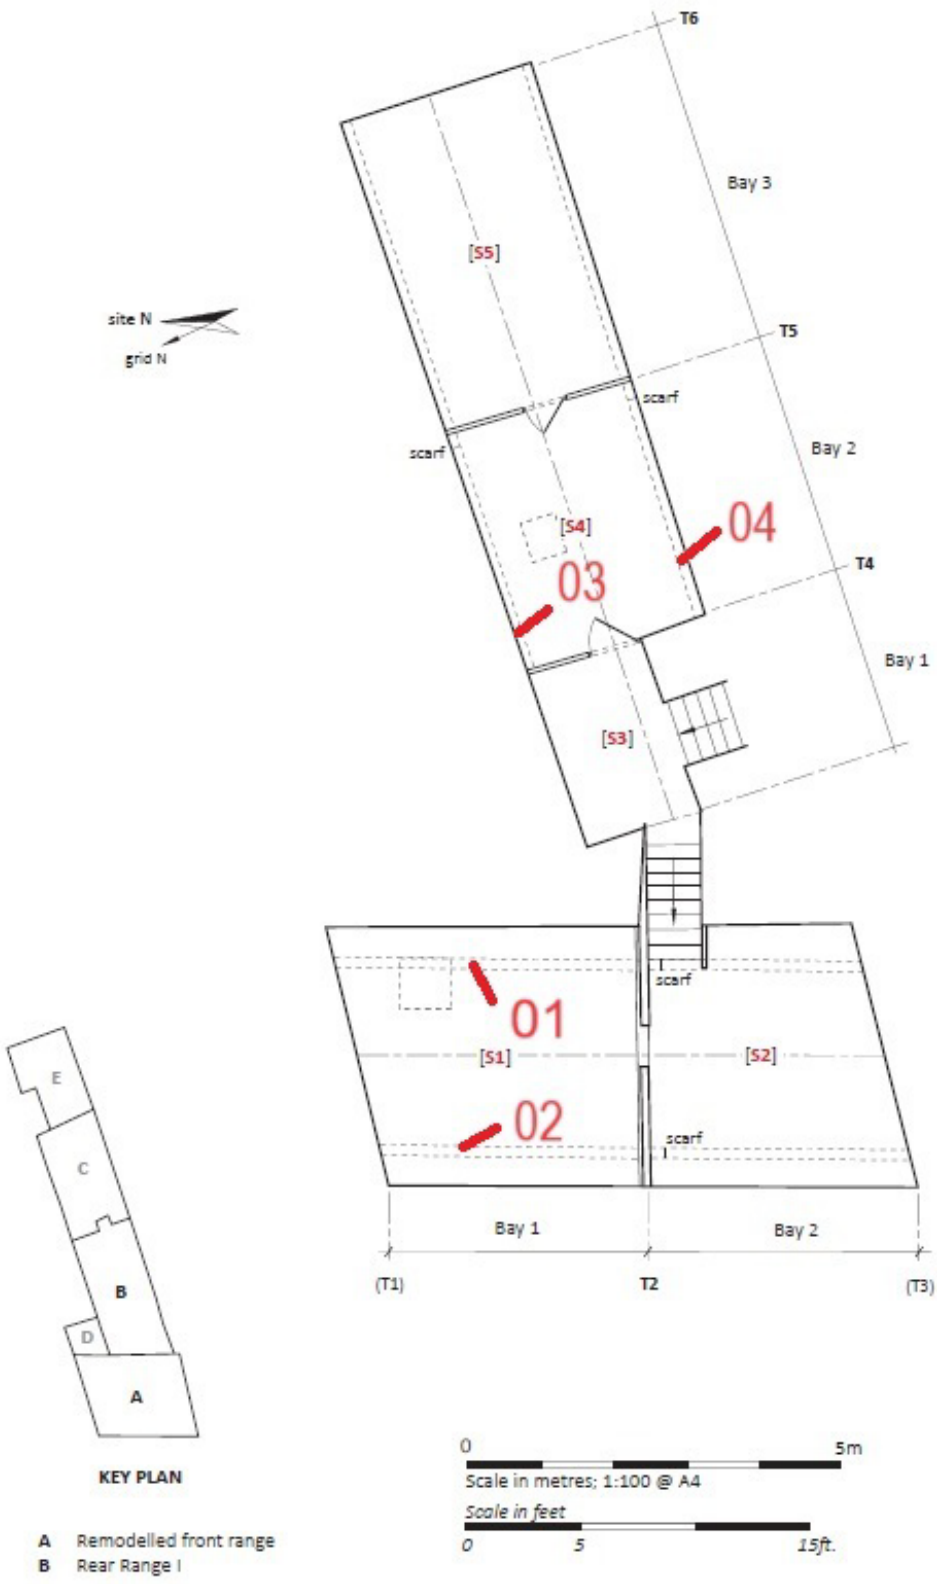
Plan of the second floor of 21 Chapel Street, showing the location of samples taken for dendrochronology. [drawing by Ric Tyler]
